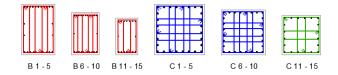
Reinforcement detailing for 15-story model, α =0.25, β =0.50, ductile confinement
